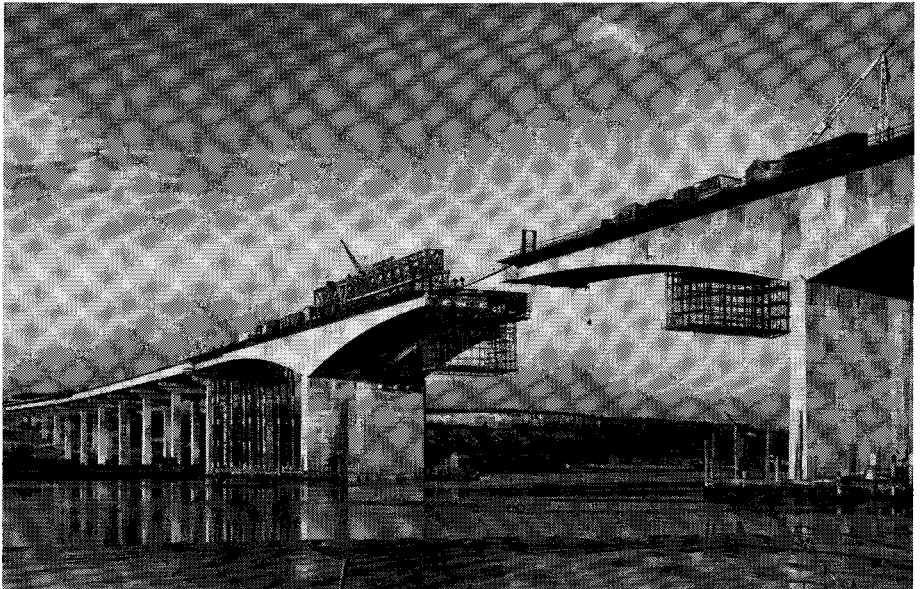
Preparing to place the 100 ft. Drop in Girder to complete the River Span.
